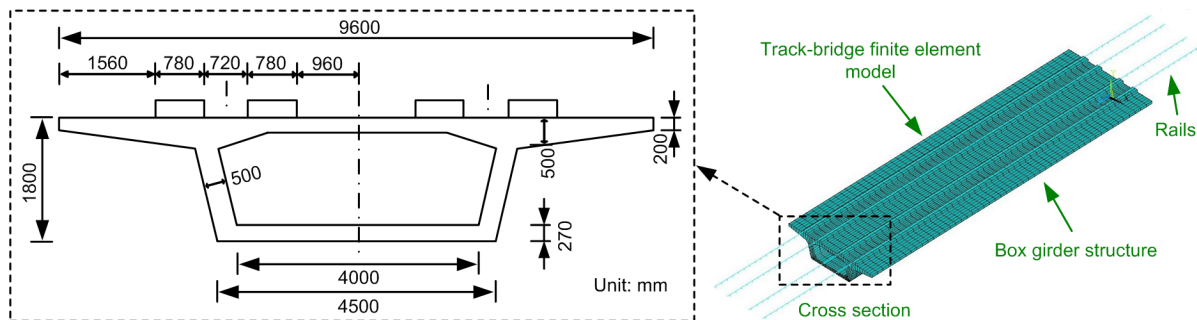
Finite model and structural dimensions of the cross section of the bridge
